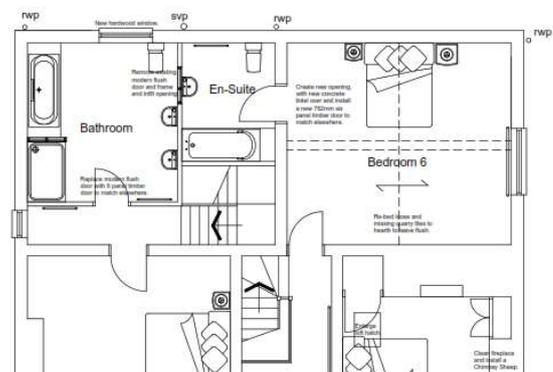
Proposed 2<sup>nd</sup> Floor Layout (Savills:2020)
